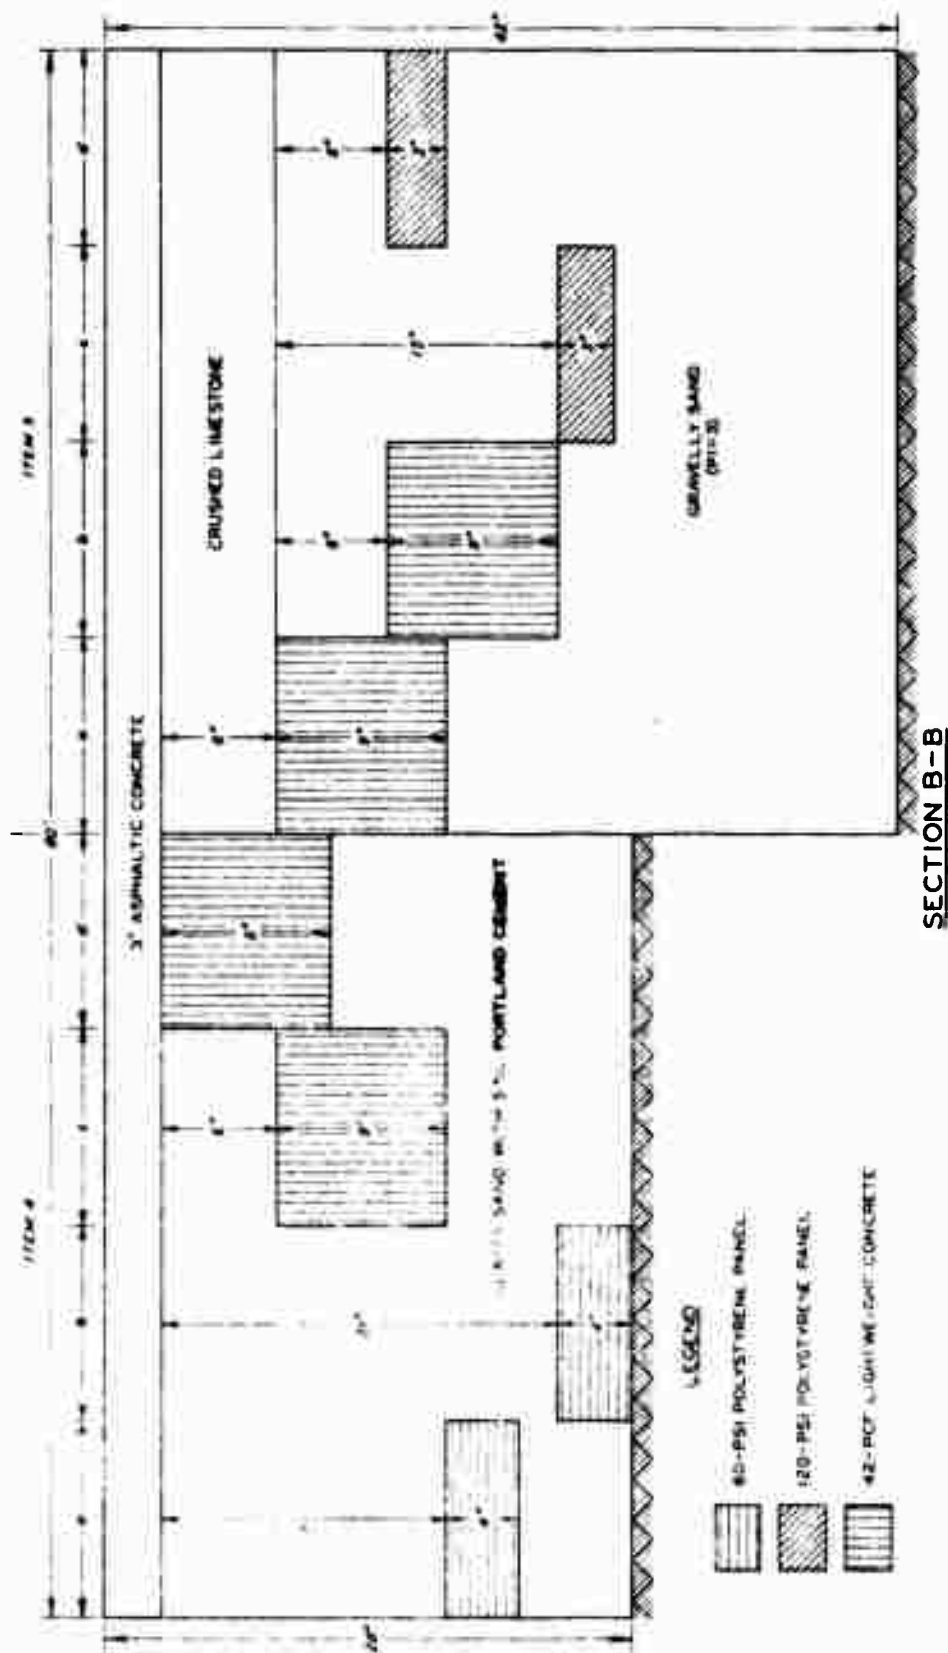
Profiles of items in the flexible pavement test section with insulating materials
